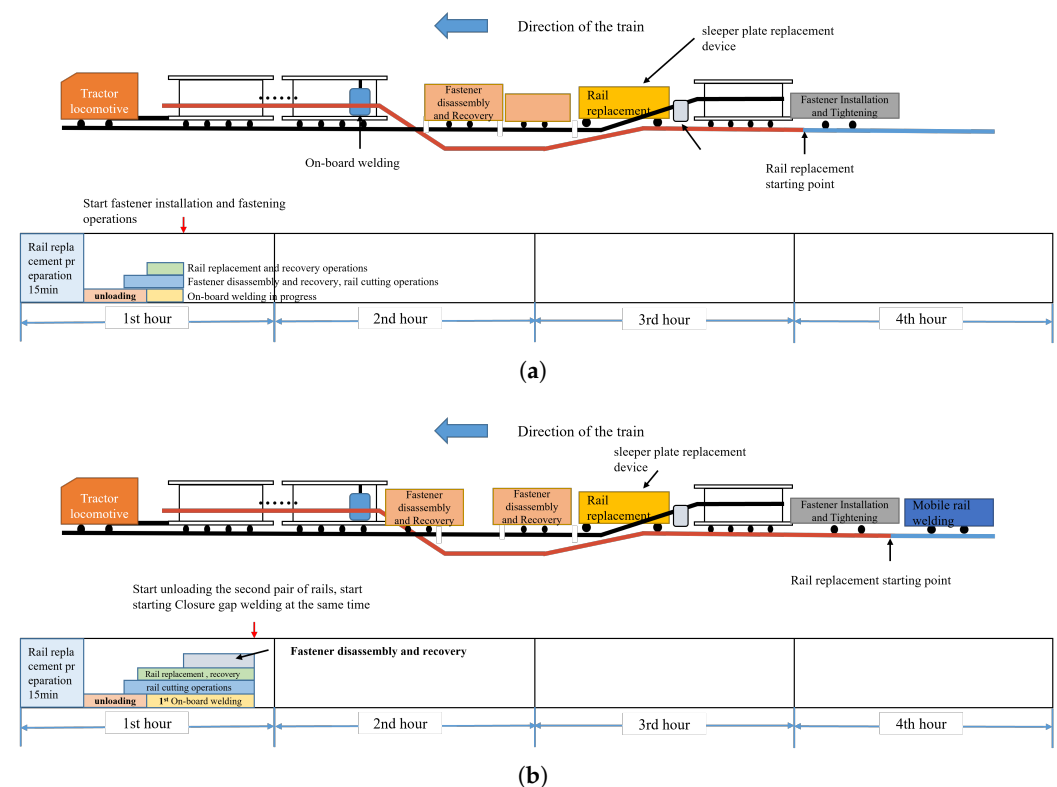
Schematic of core operation stage 2: (a) fastener installation and tightening; (b) unloading 2nd pair of rails and initial closure joint welding.
